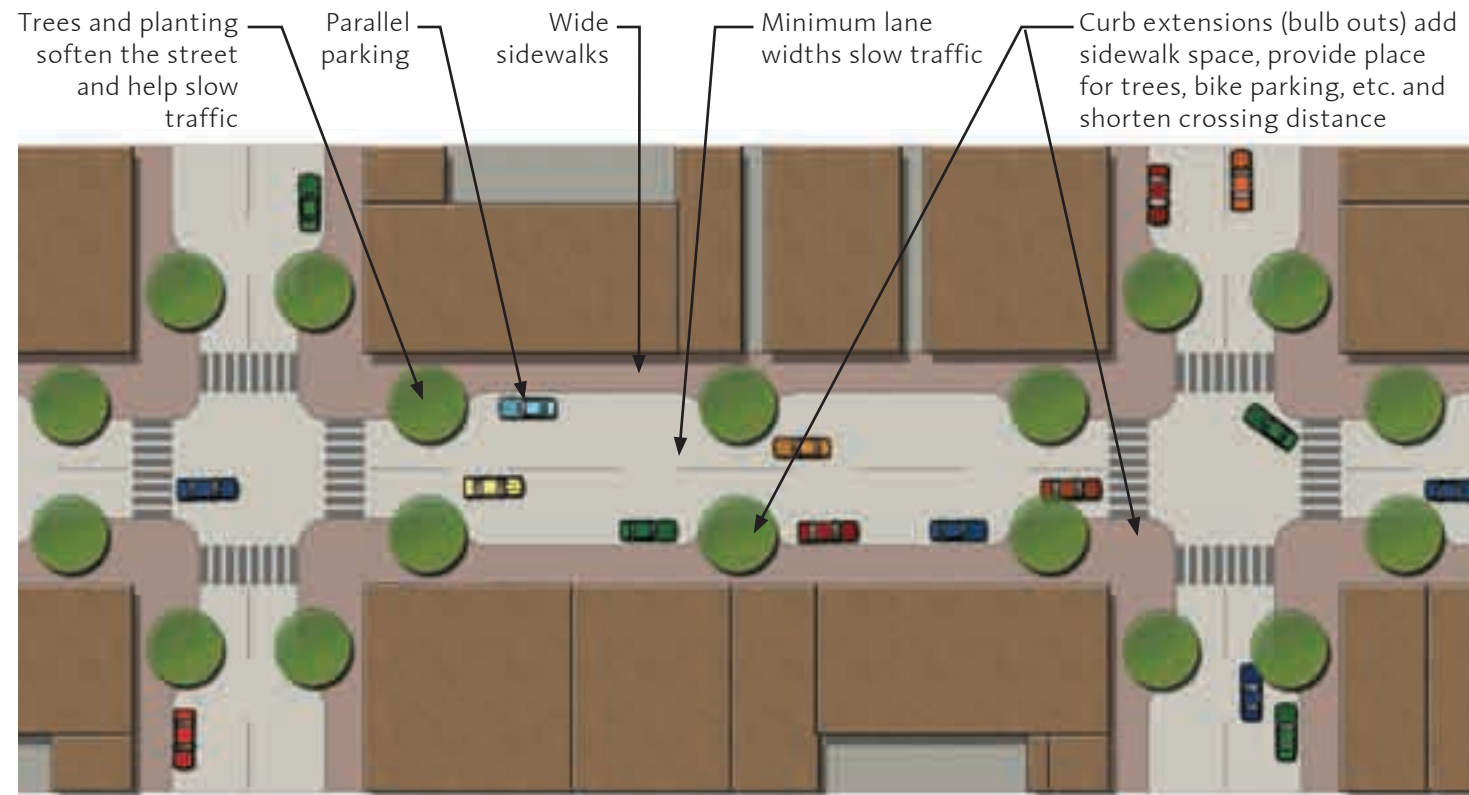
Traffic-calming features such as street tree planting, on-street parking, and curb extensions accentuate downtown community areas.
